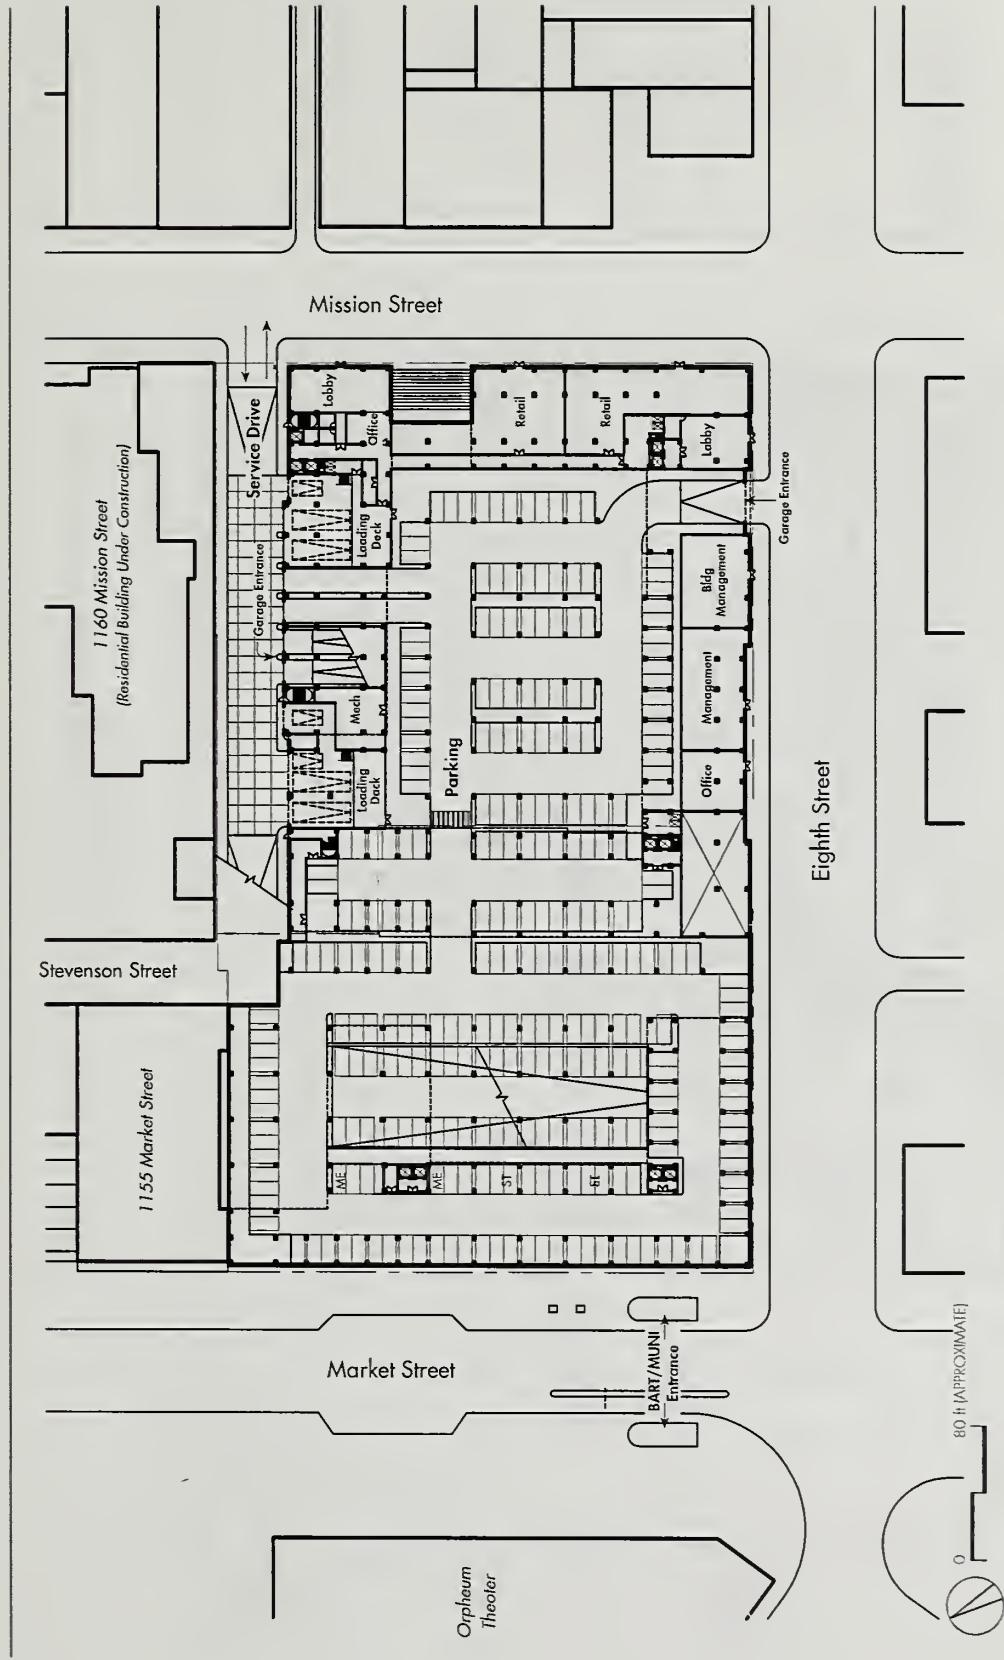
PARKING LEVEL FLOOR PLAN (AT MISSION STREET GRADE)
